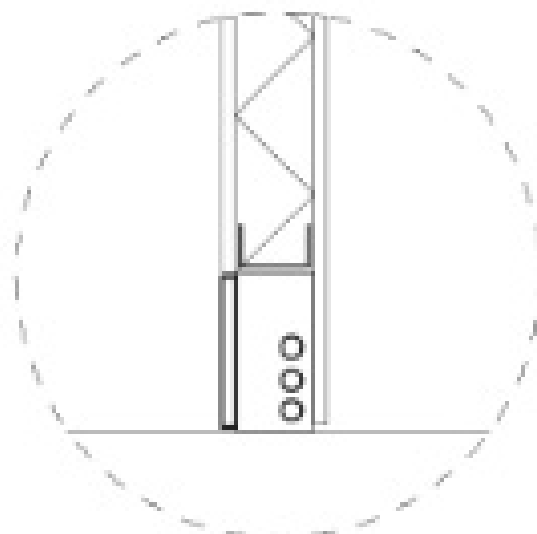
Electric wiring inside interior wall detail. (Source: Marc Koehler Architects, n.d.)
